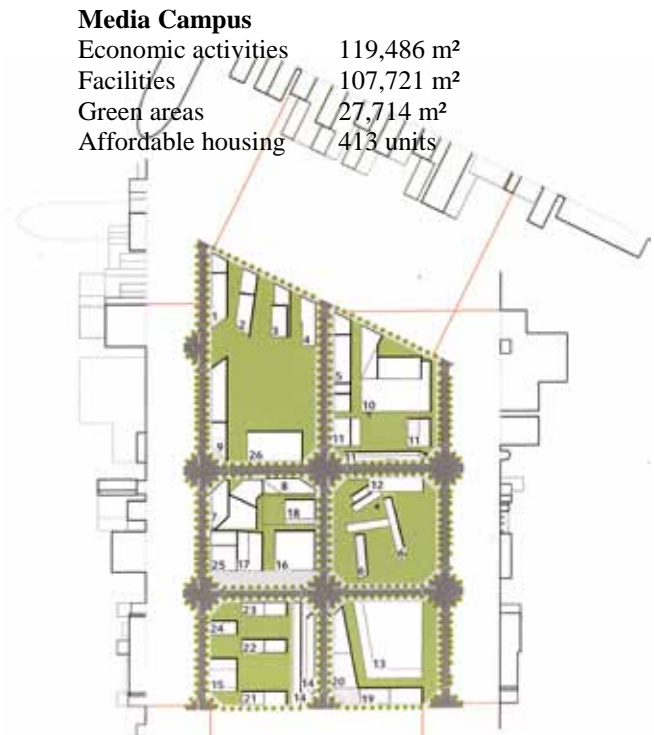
Audiovisual Campus general plan (Ajuntament de Barcelona, 2008)
